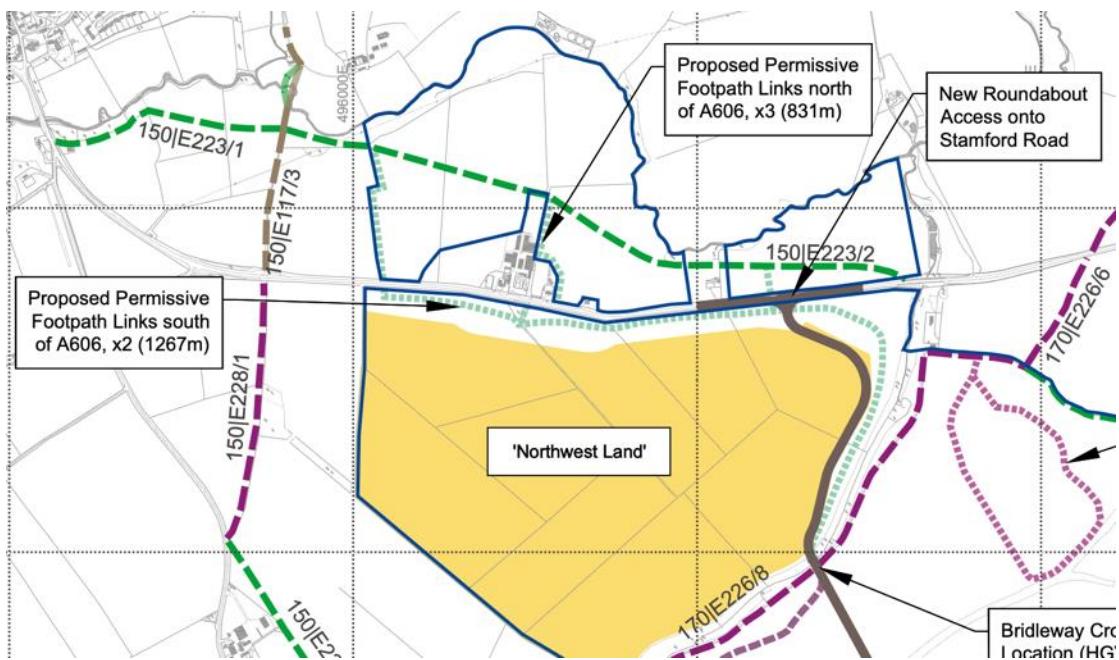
Proposed Permissive Paths Connecting Empingham to Bridleway E226.
